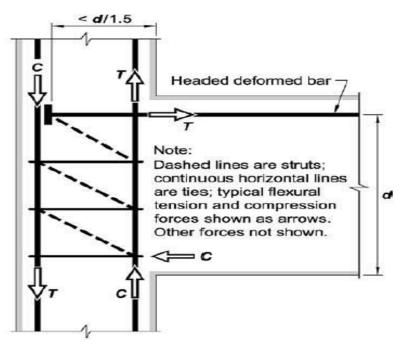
Breakout failure precluded in joint by providing transverse reinforcement to enable a strut-and-tie mechanism.
